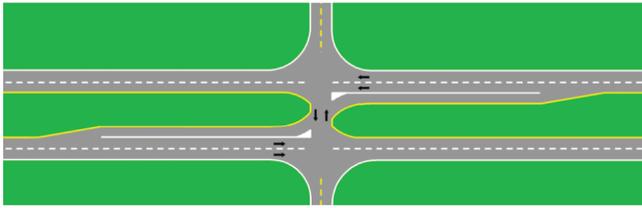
Plan view of a typical divided highway intersection with left-turn bays (18).
